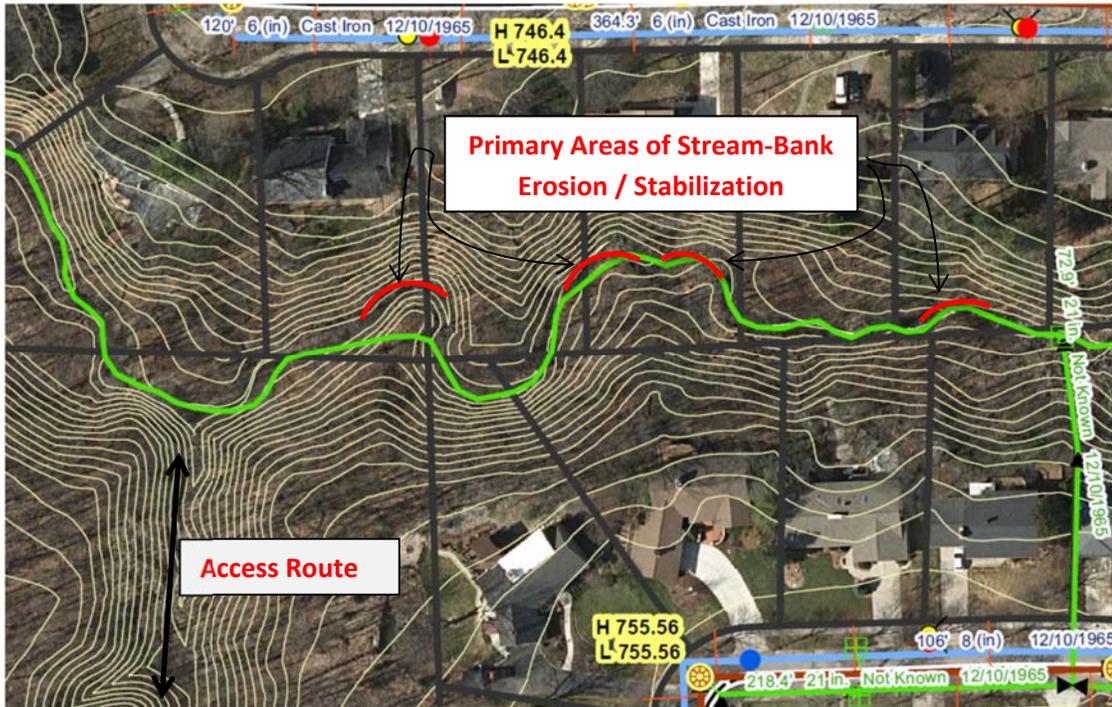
Proposed Area of Streambank Stabilization and Potential Access Route for a limited streambank stabilization project. Only the specific areas in red would be addressed.
